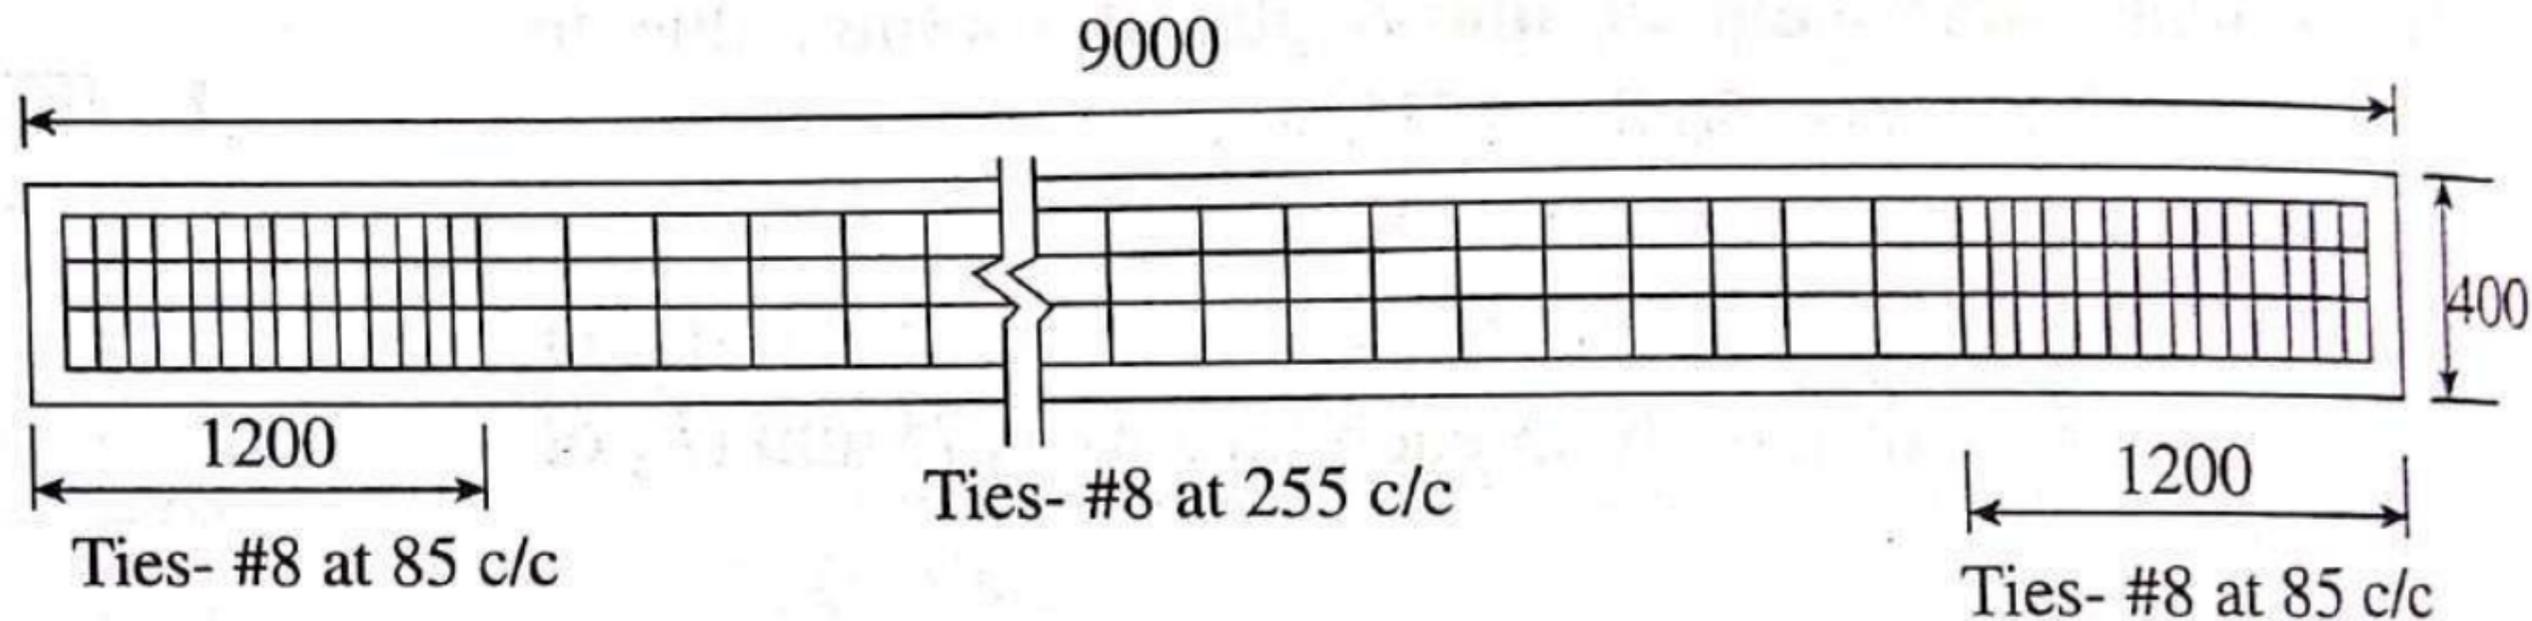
MINIMUM STEEL REQUIREMENTS OF PRECAST CONCRETE PILE
